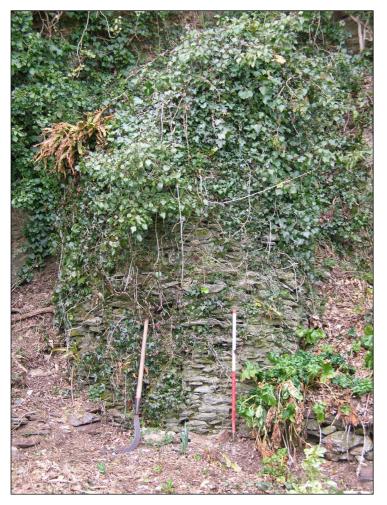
View of the winding engine boiler house chimney before works C Buck 2010© CC HE
